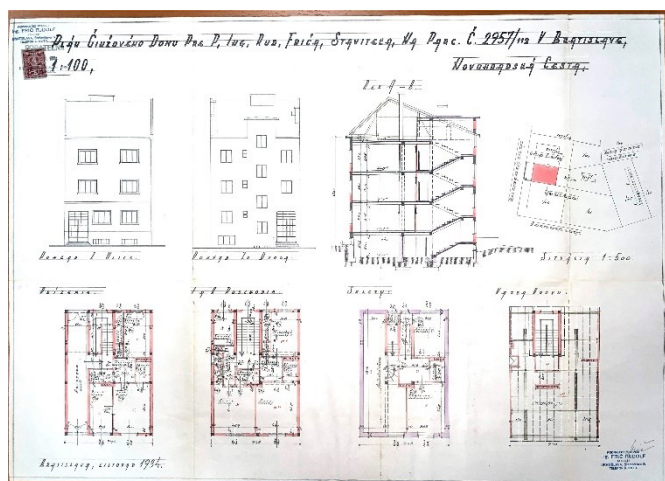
Tenant house of Rudolf Frič in Novohradská Street, Bratislava - ground-floor plan, complete plans. (Source: State Archives in Bratislava, Slovakia, fund "Daňová správa Bratislava", box 129, 1934)
